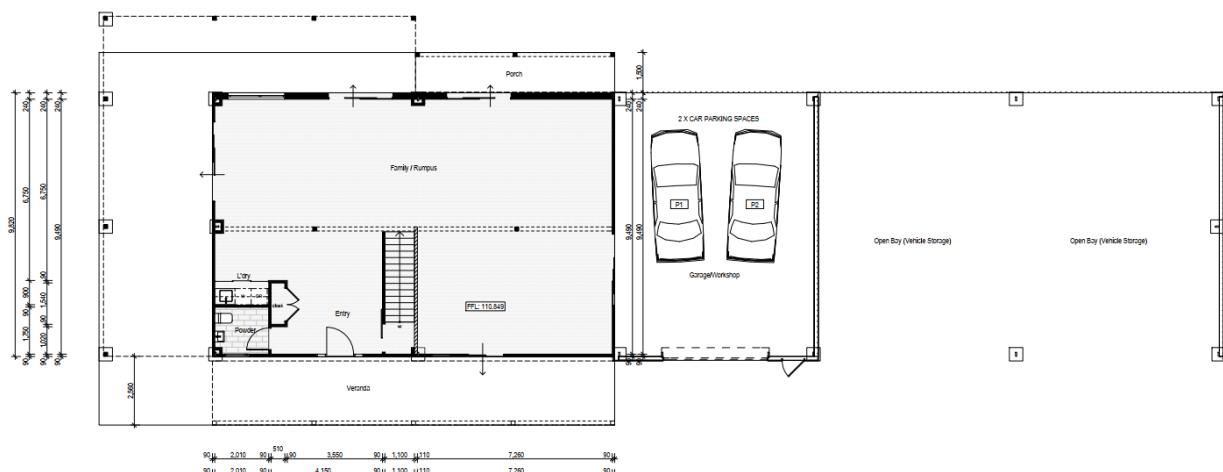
Dwelling ground level floor plan showing the family/rumpus room, the two-car garage and open bays to the right.
